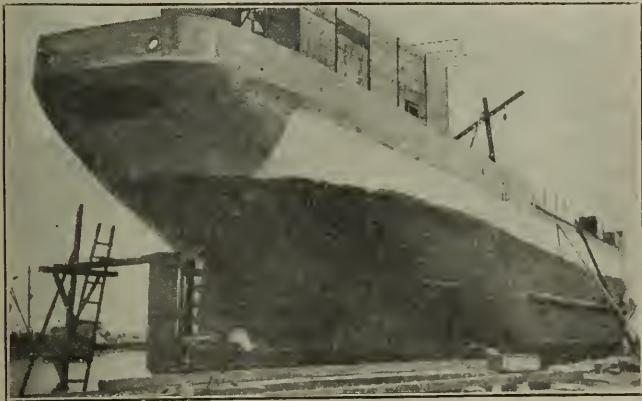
THREE-FOOT UNDERCUT FAILS TO INJURE CONCRETE SLAB
